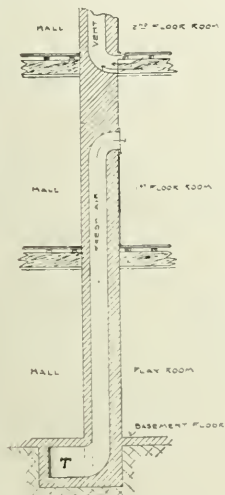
Heat riser to first floor and ventilating flue for second floor, SS. Peter and Paul's Cathedral Academy. Third floor rooms are a like application.
